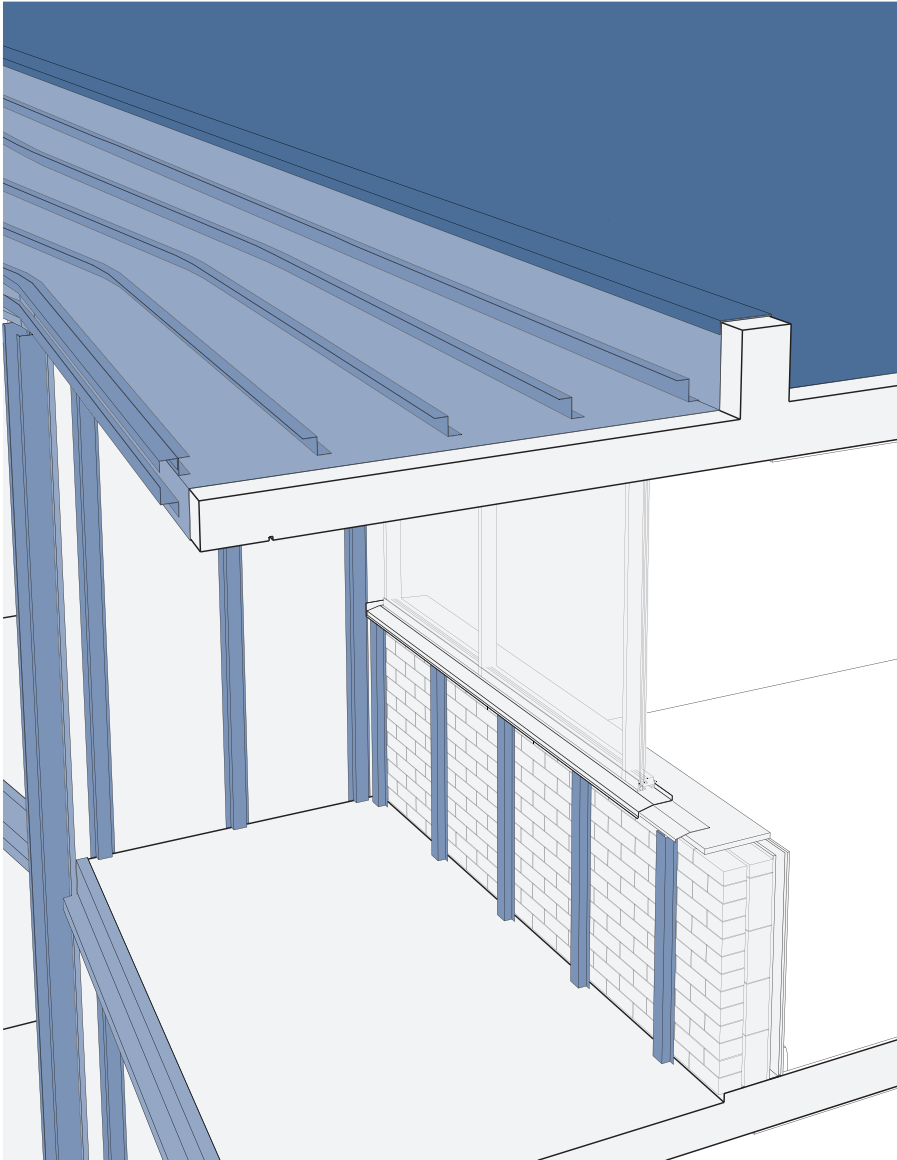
A waterproofing membrane(s) is applied over the main roof section overlapping the projecting roof at the parapet.
